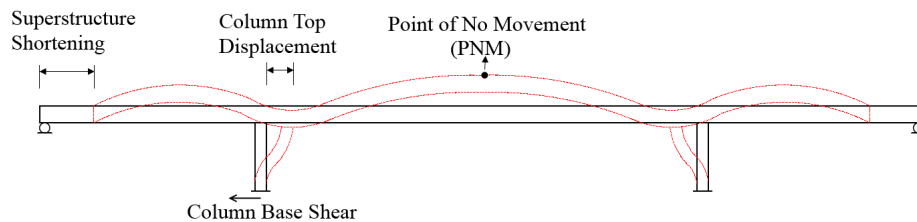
Deformation of a posttensioned concrete box-girder bridge due to prestressing, creep, and shrinkage
